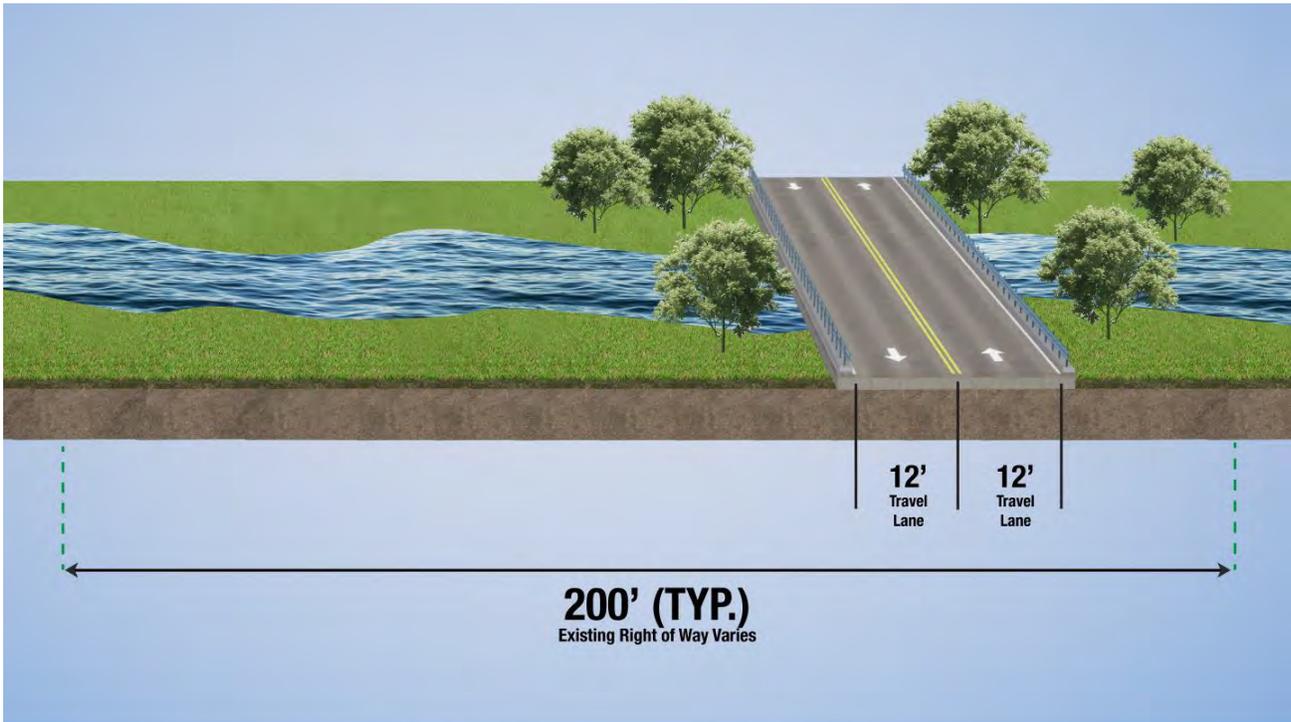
Typical Section for Existing Bridges Over Whidden Creek and Joshua Creek
